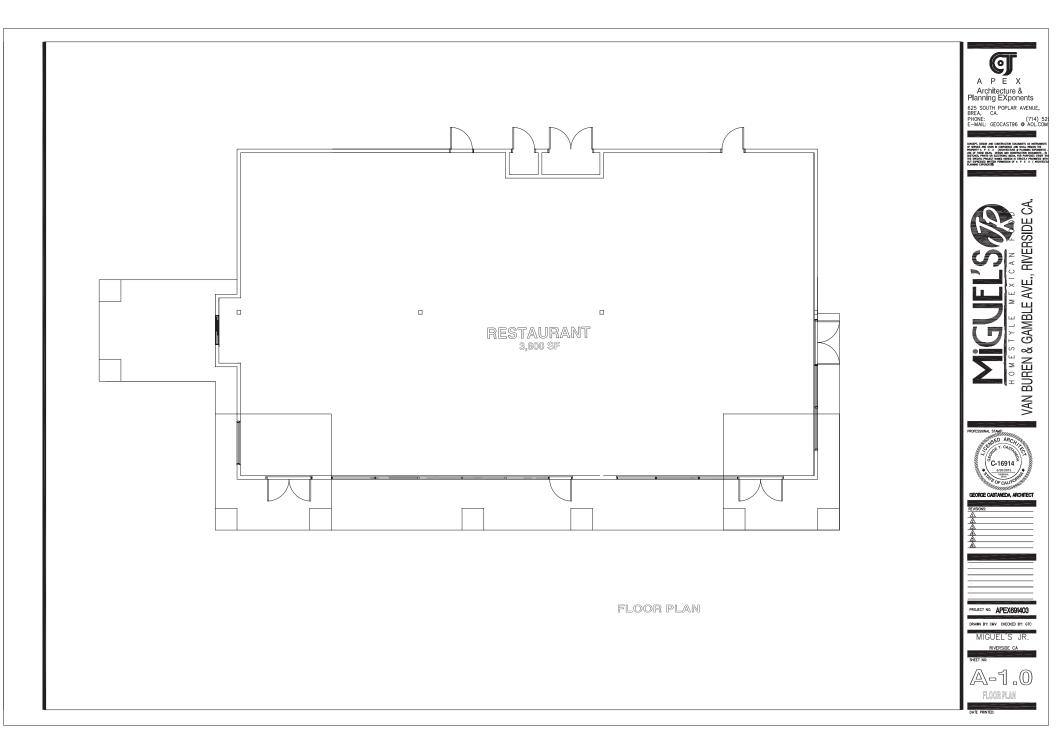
P15-0303, -0304, -0305, P14-0973, Floor Plan Miguel's Jr
